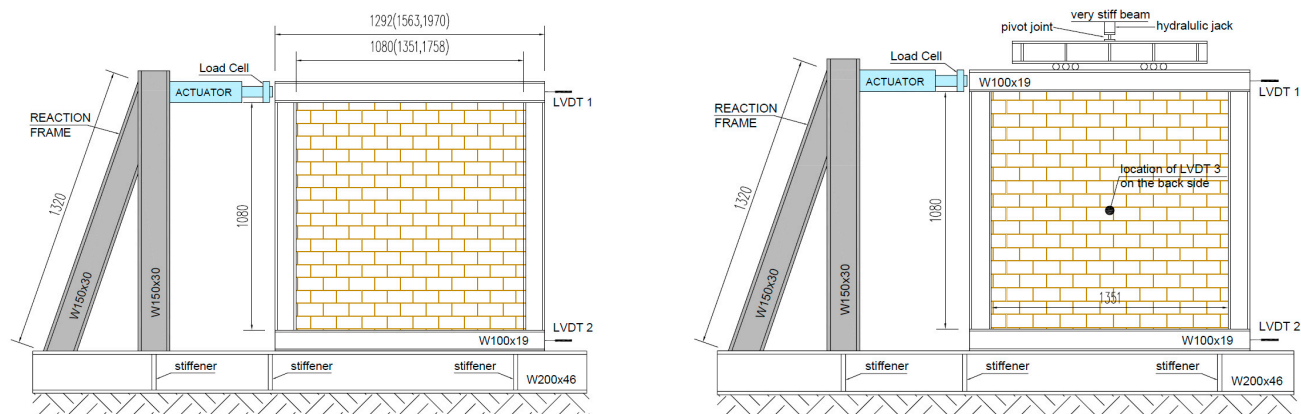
Tested frame configurations ((left) without the action of vertical force—adapted from [36]; (right) with the action of vertical force—adapted from [38]).
